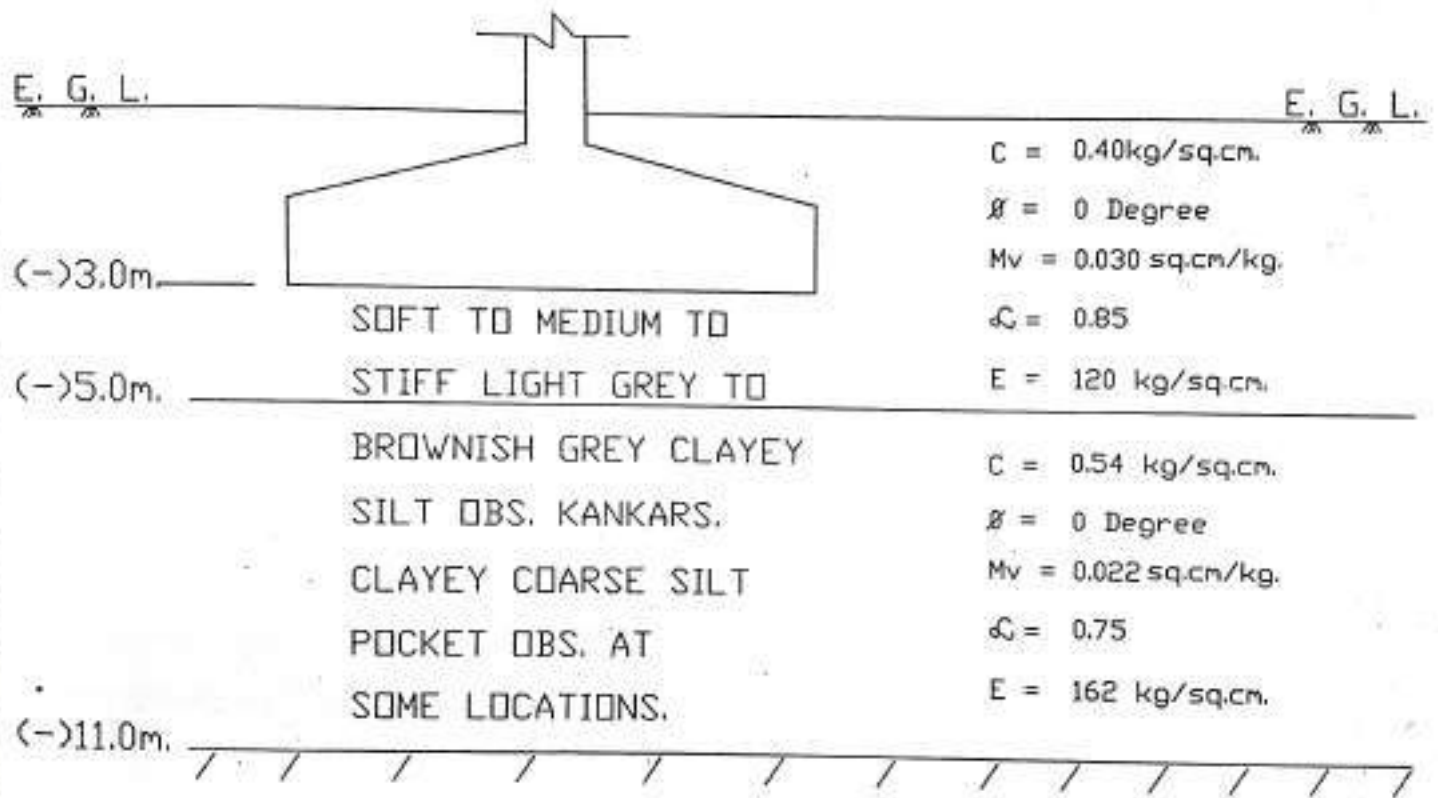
FOUNDATION DESIGN MODEL FOR SHALLOW FOOTING.
